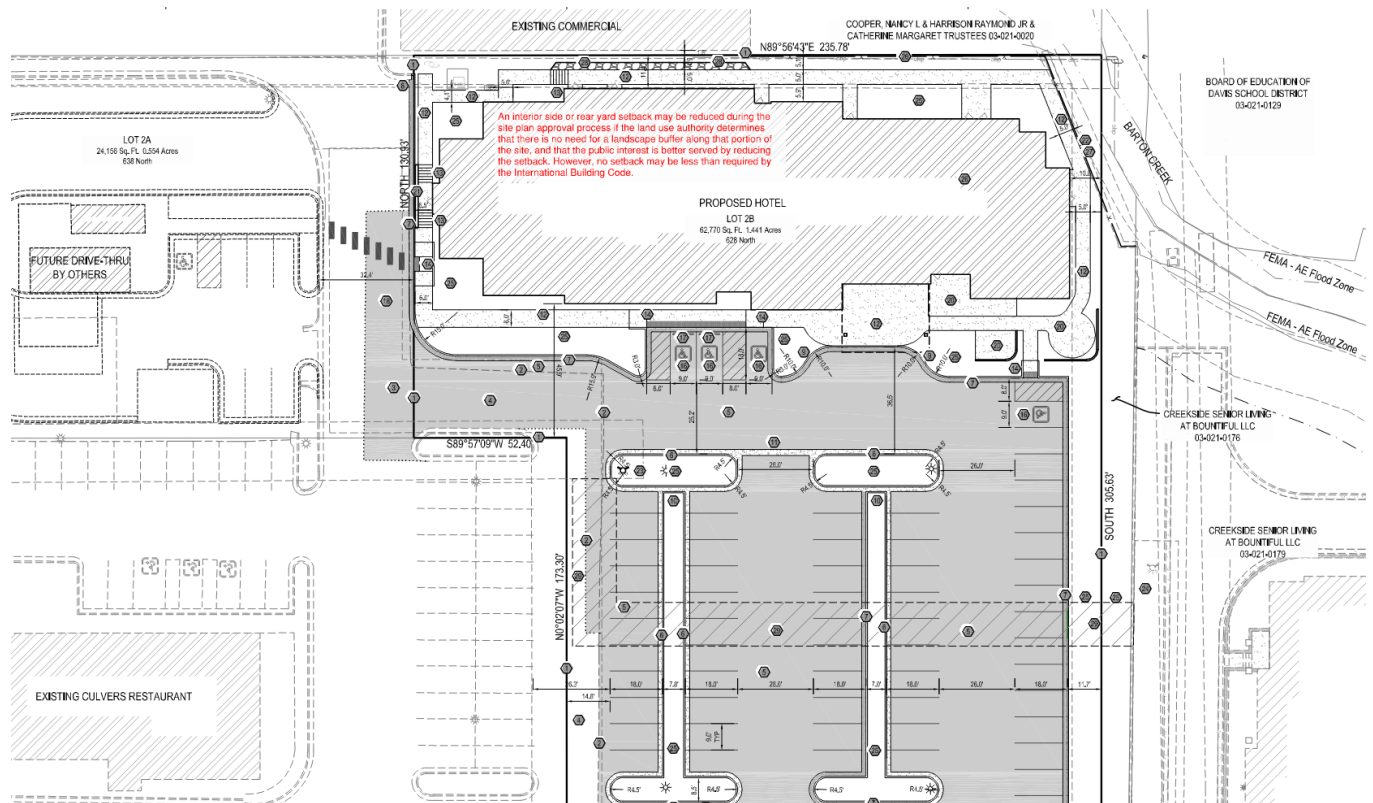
Proposed Site and Civil Plan, Page C-1.0
